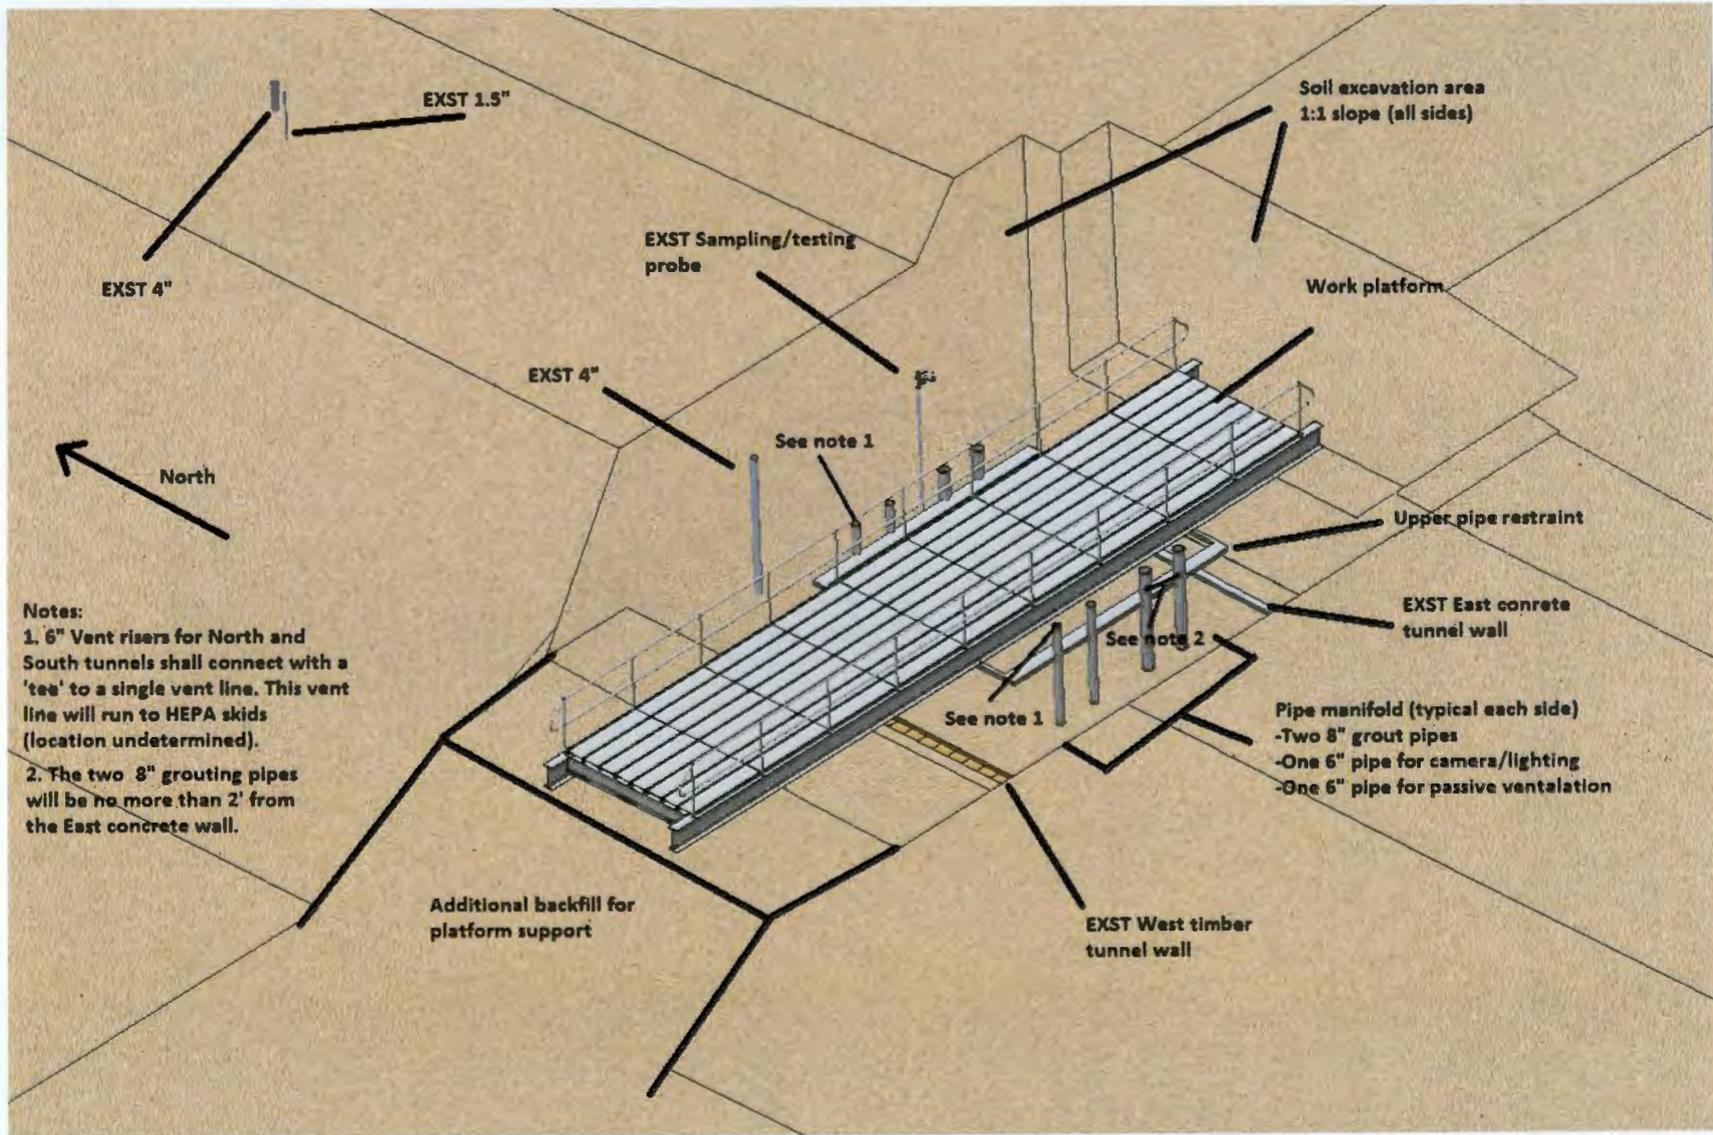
Isometric of Tunnel Number 1 Grouting Equipment – Platform and Piping Arrangement
